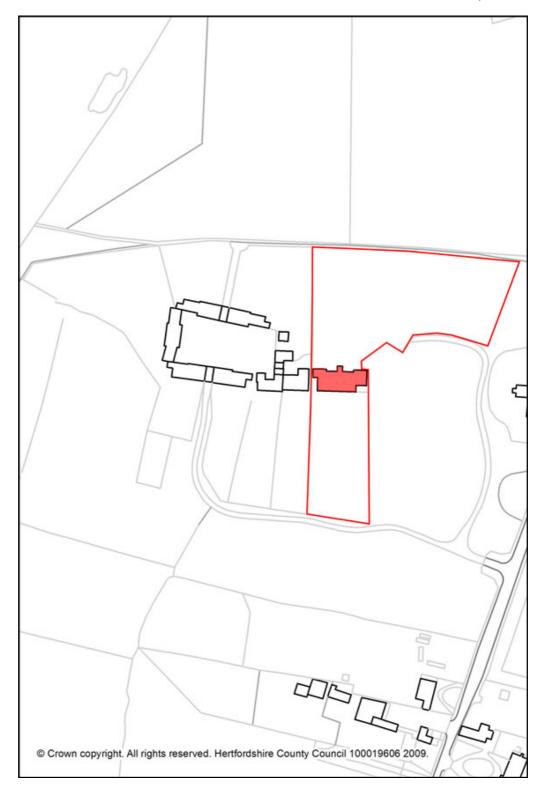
Northaw Place. Site plan; boundary and house are marked in red
